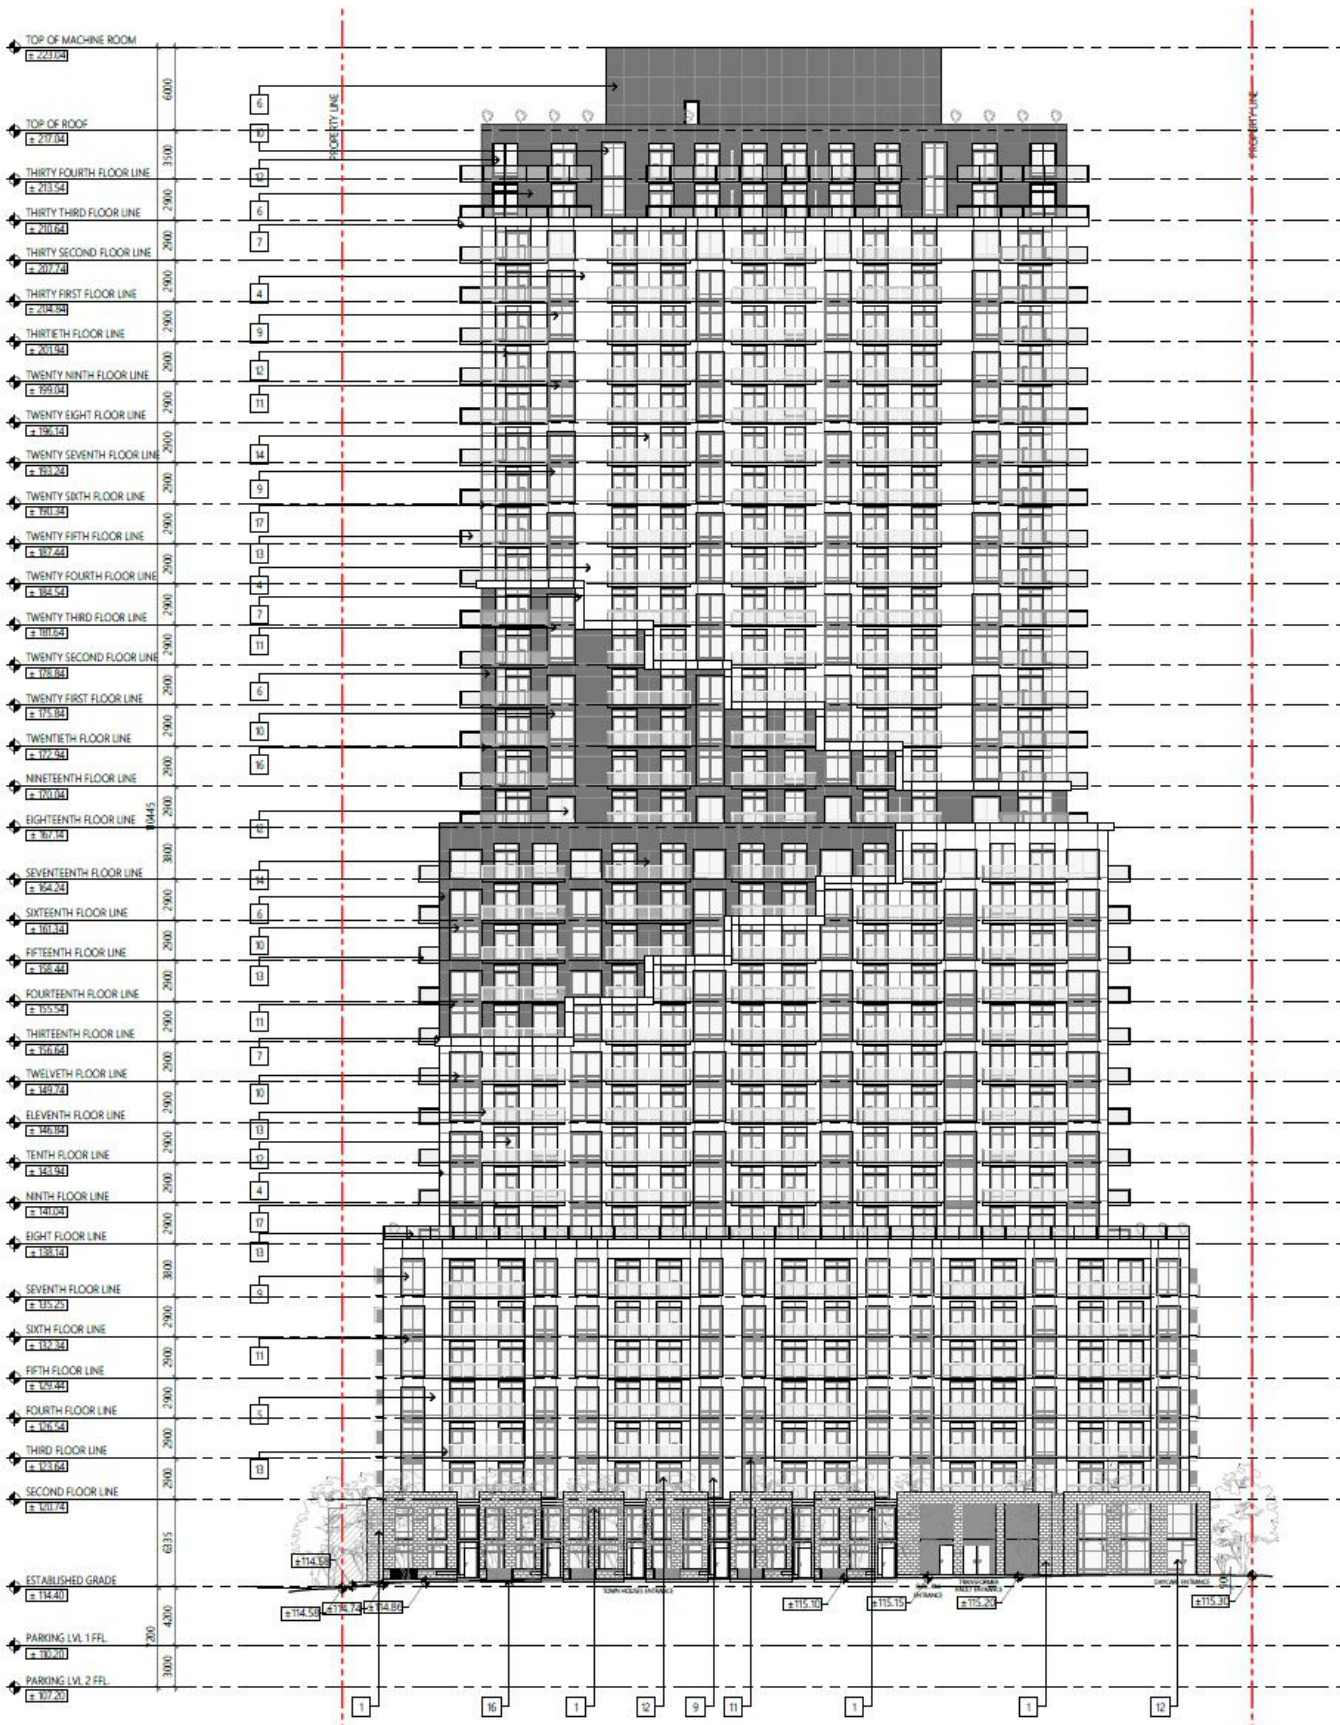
Elevation along Agnes Street (Source: Lumbao Architects)
